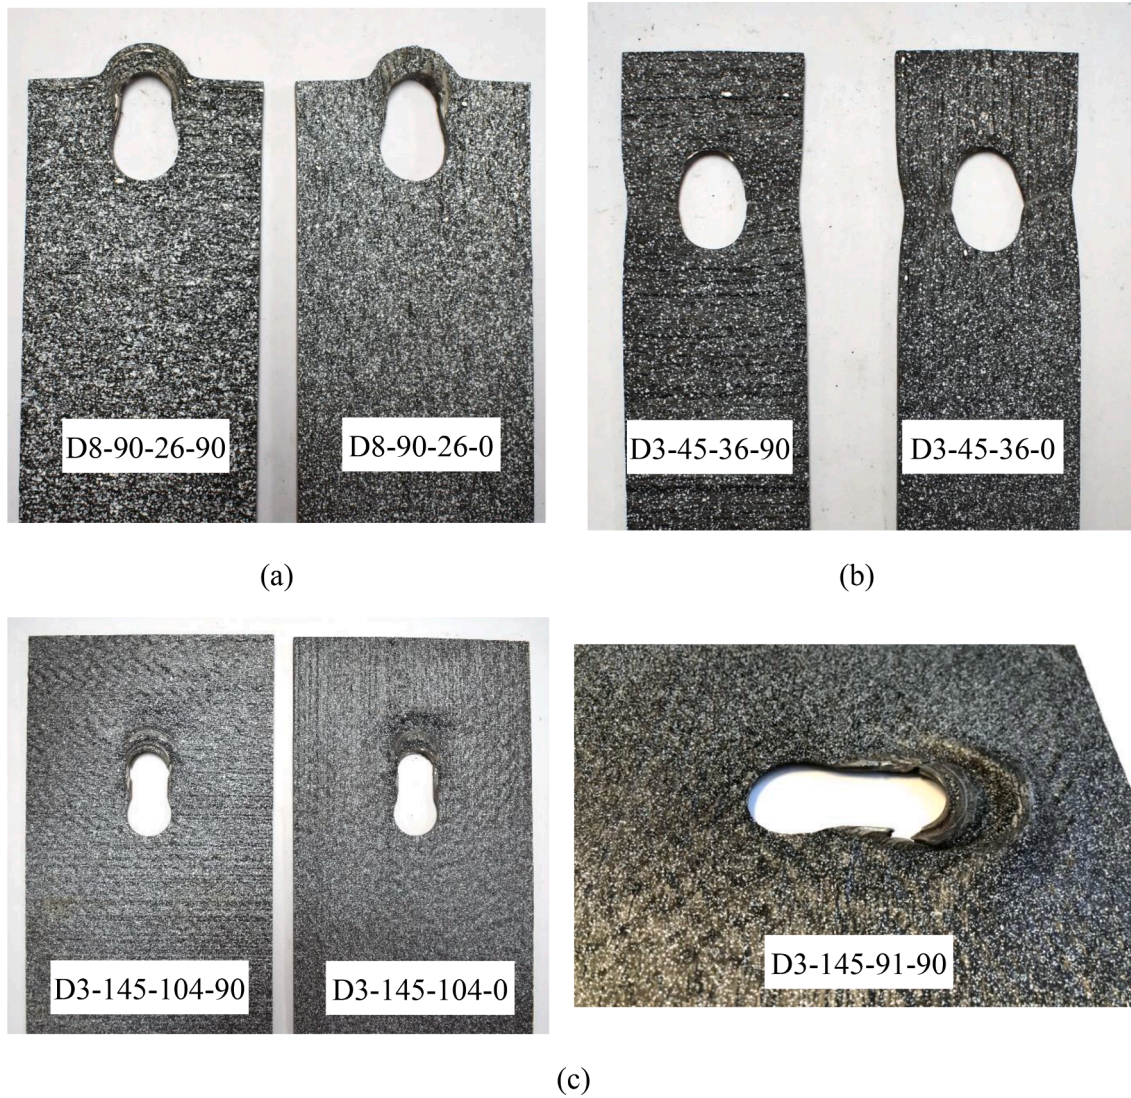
Typical failure modes: (a) shear-out, (b) net section tension and (c) bearing failure.
